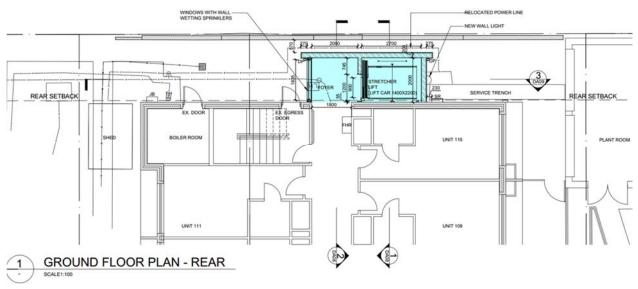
Rear lift and associated foyer addition Source: Proposed Drawings – Plans, prepared by Gran Associates
